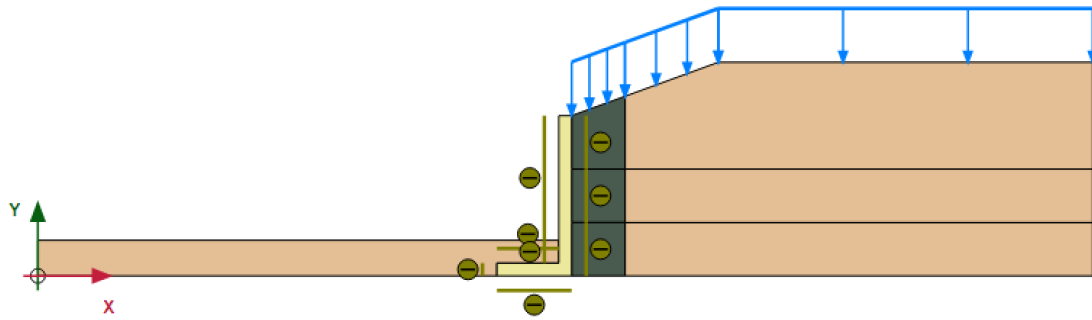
Retaining wall with backfill slope 20° and 1.5m TDA backfill
